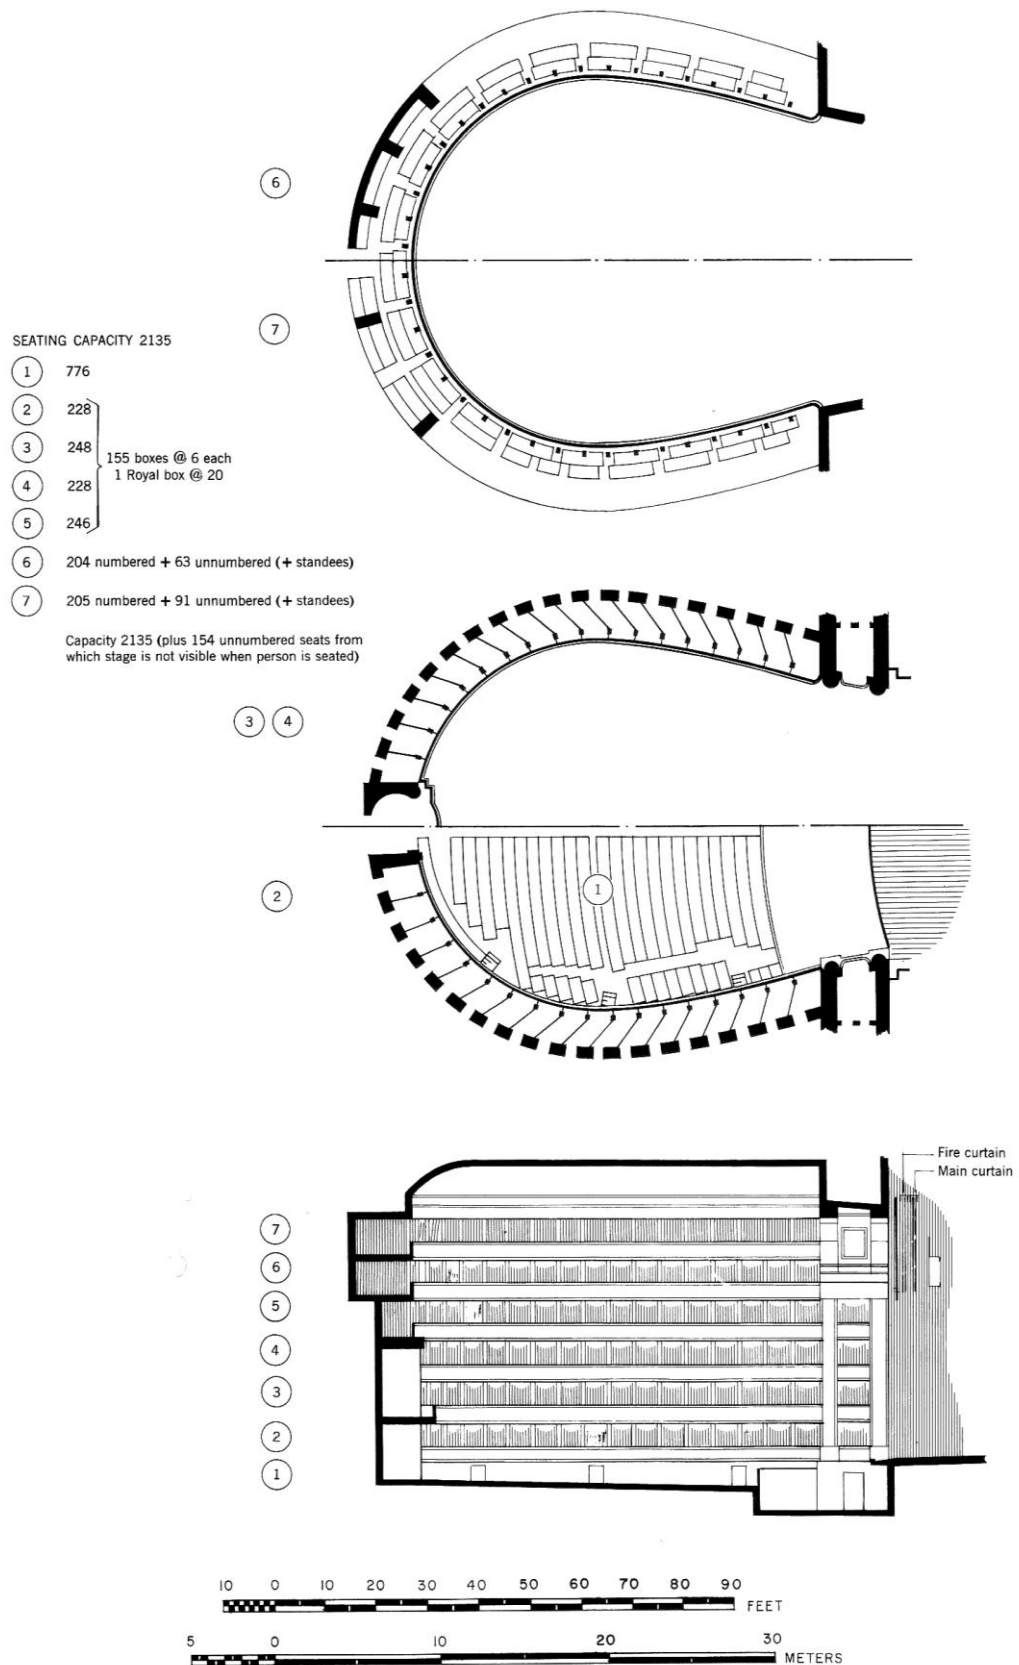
Italy, Milan, Teatro alla Scala, plan and section
